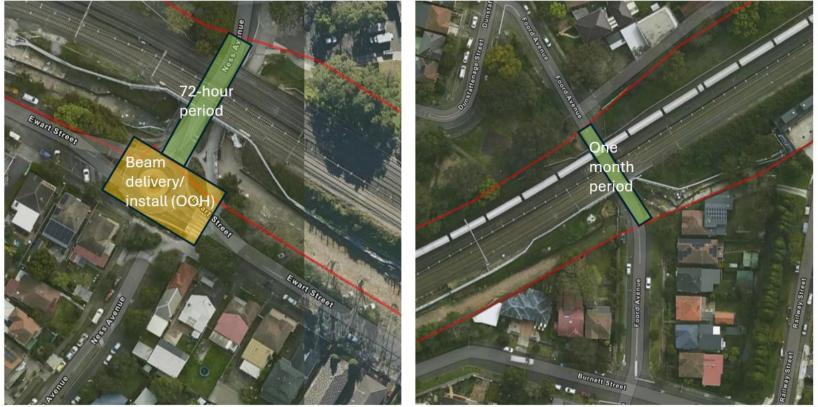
Ness Ave/Terrace Road, Dulwich Hill & Foord Ave, Hurlstone Park proposed full road closure
